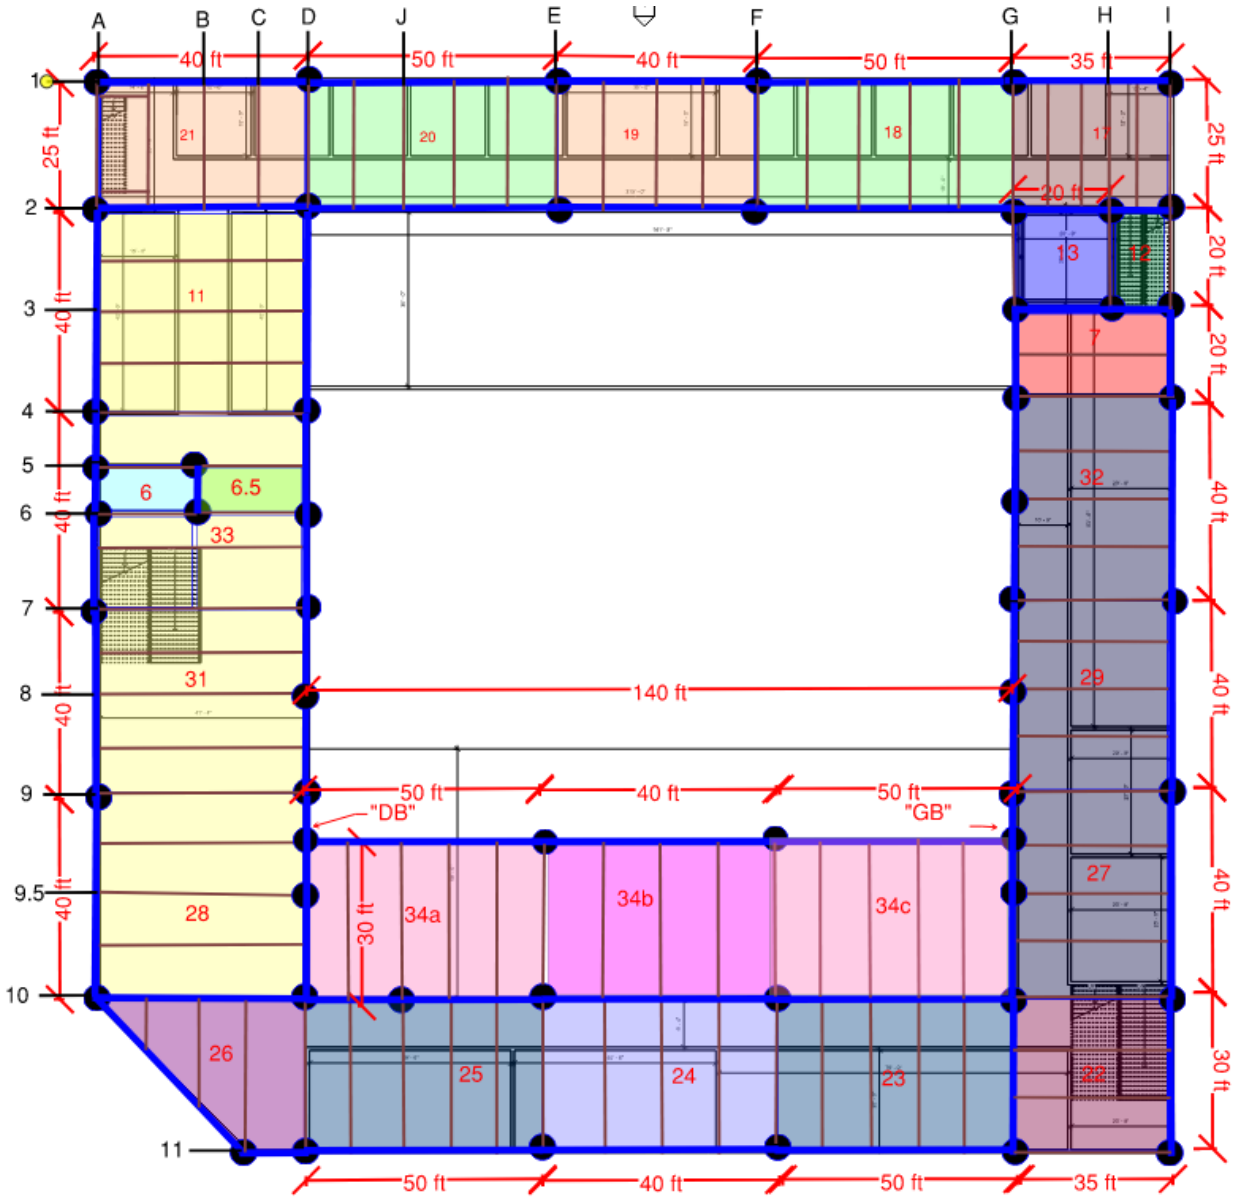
Bluebeam Markup of Beams, Girders, and Columns for the Basement Floor Plan
